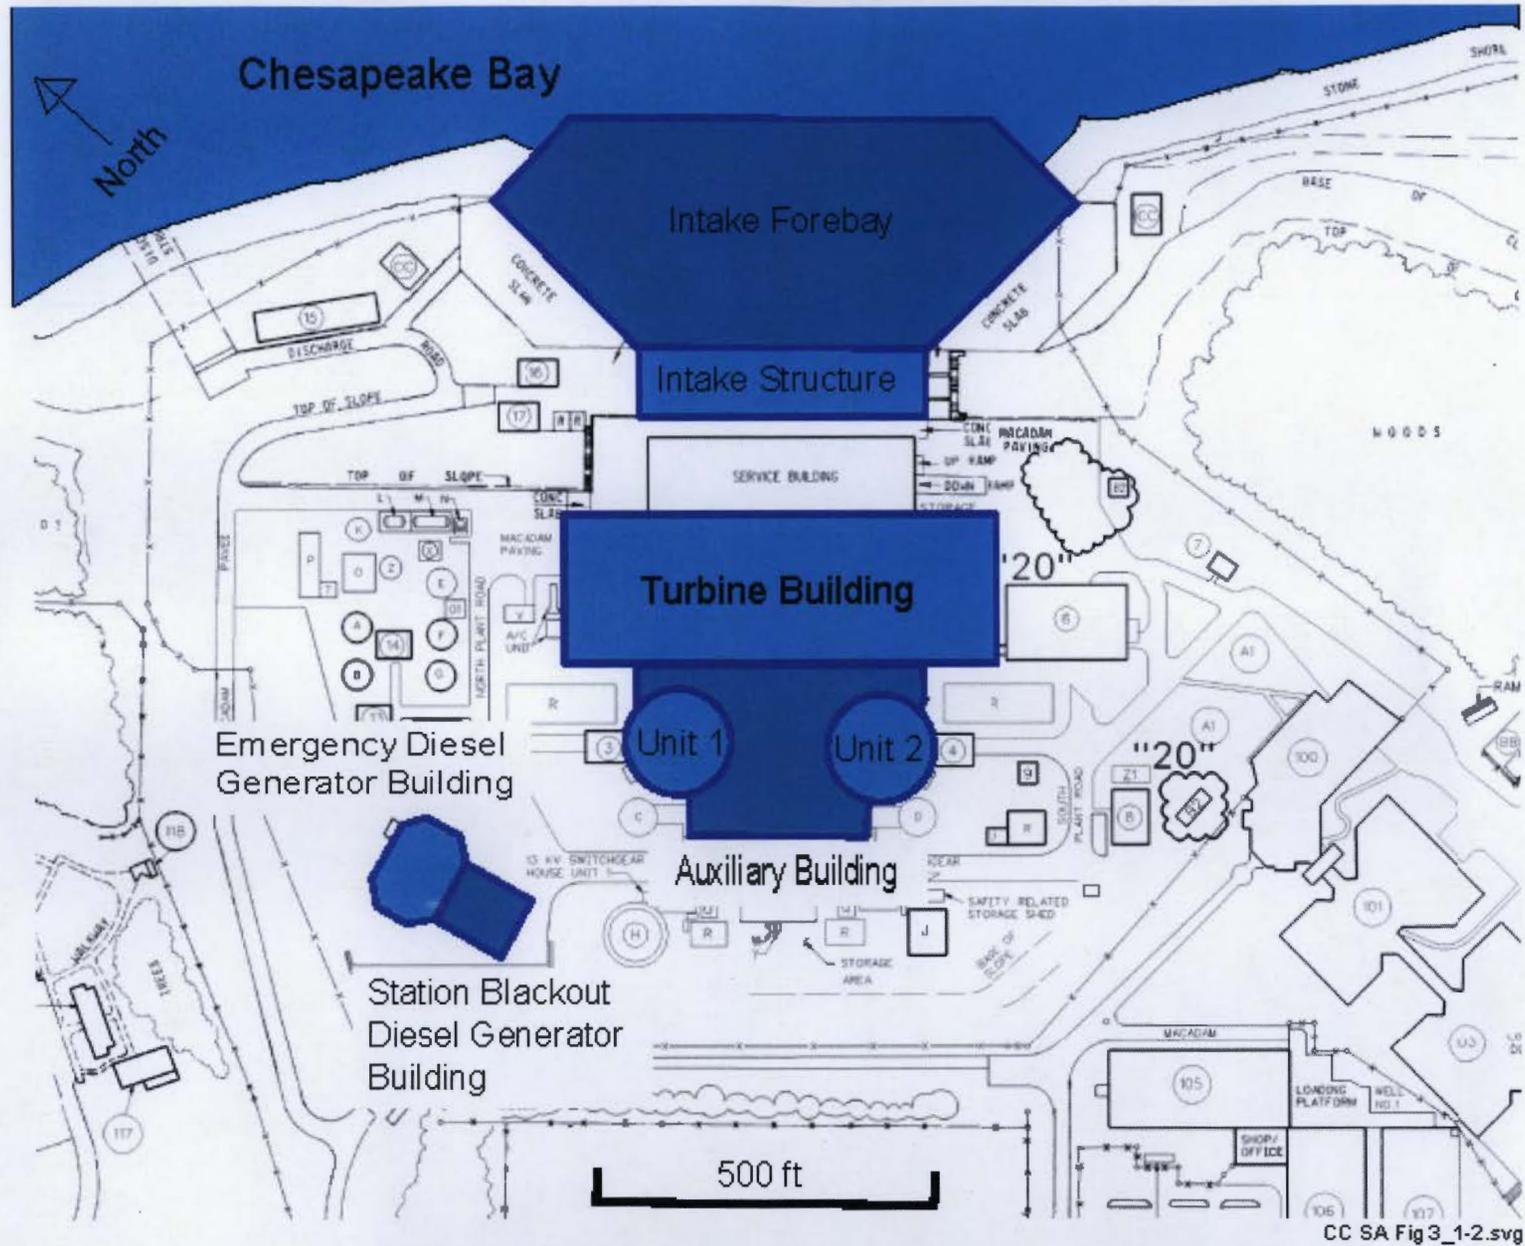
CCNP Units 1 and 2 Plant Property and Buildings (Modified from CENG, 2013a, Figure 1.1-3)
